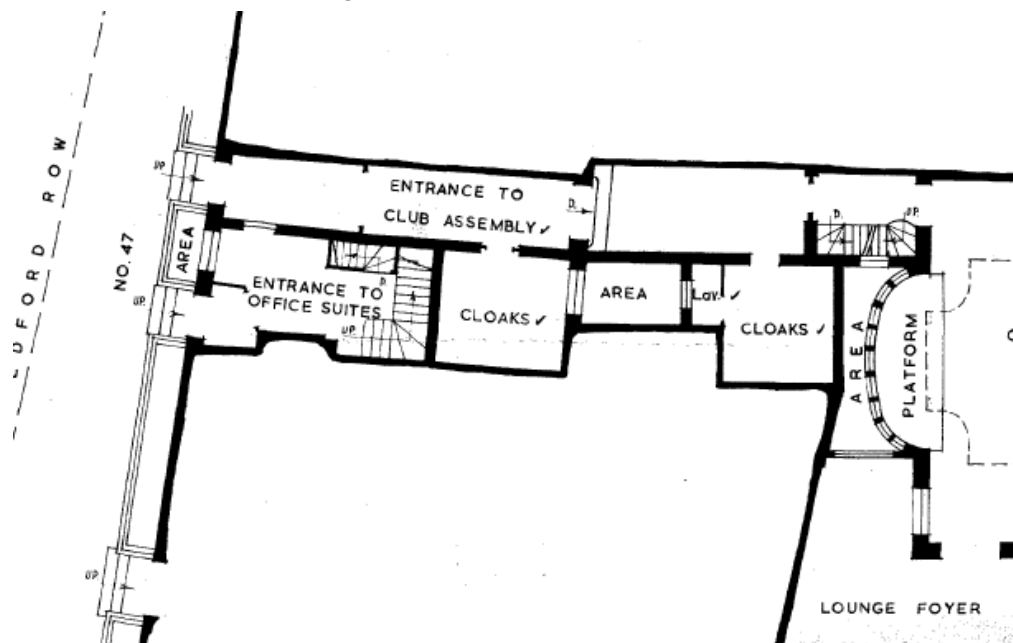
Ground floor plan of No. 47 Bedford Row (extract), 1951
